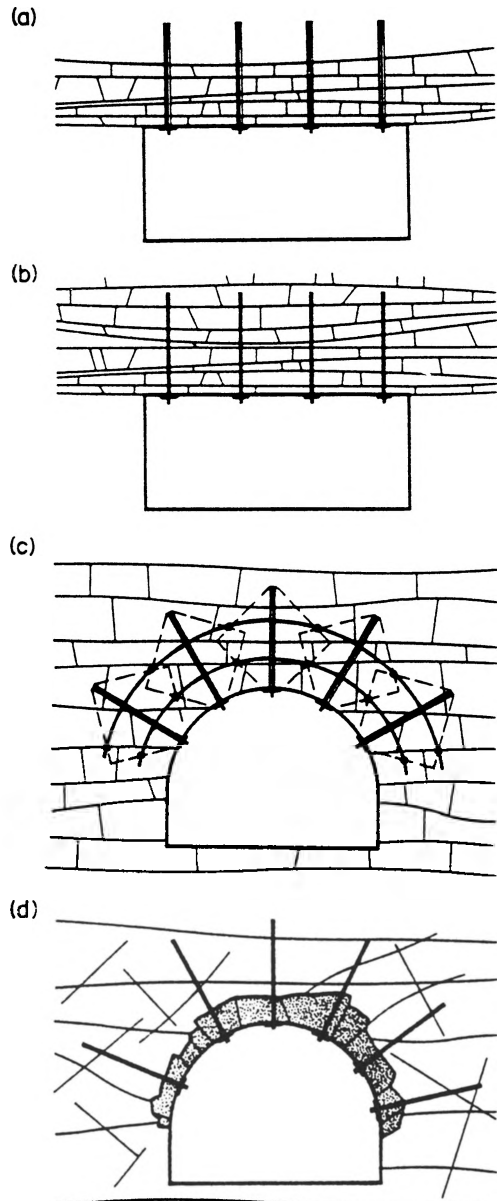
Types of rock mass response produced by reinforcement (a) suspension, (b) beam building, (c) arching and (d) keying (Windsor & Thompson 1993).
